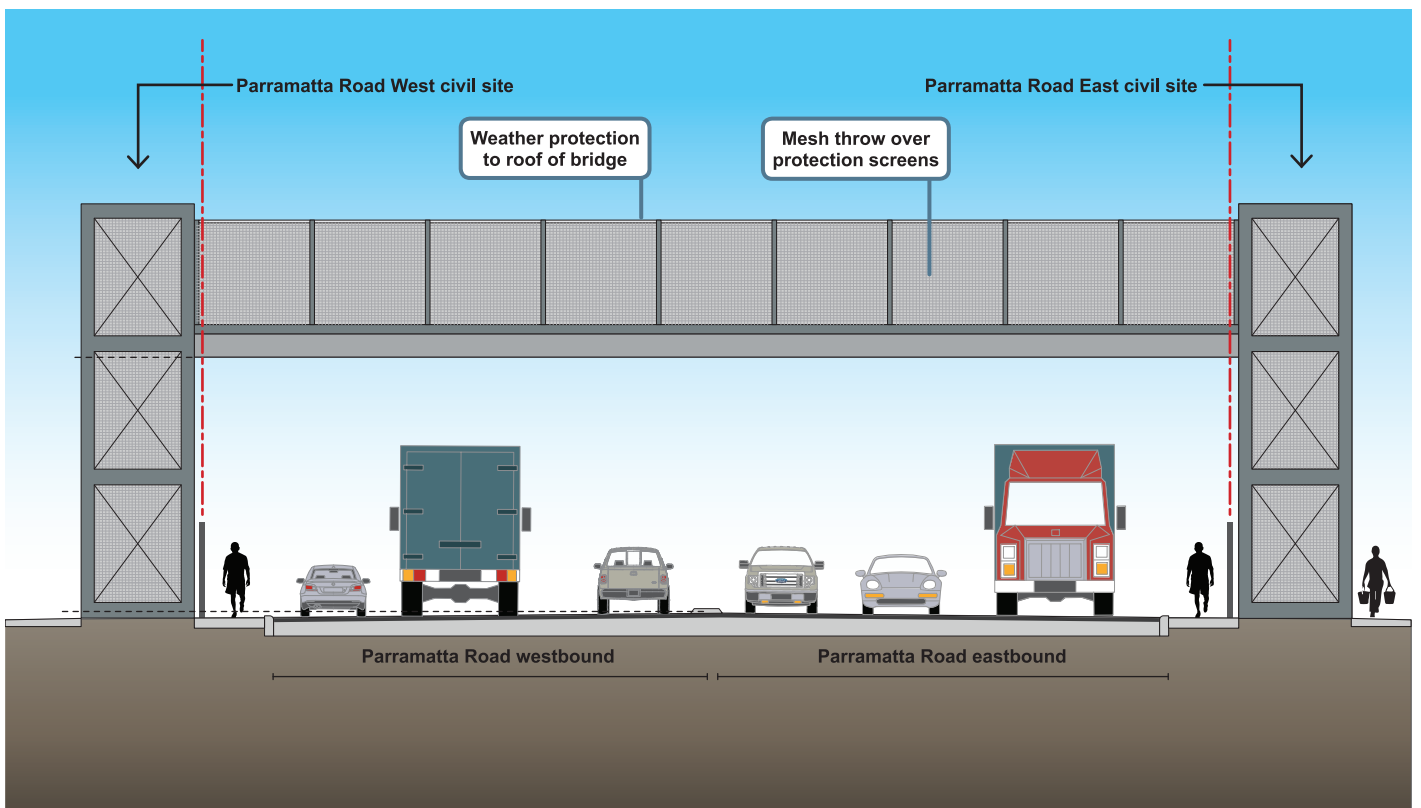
Indicative location and design of Parramatta Road West and Parramatta Road East overhead pedestrian walkway
